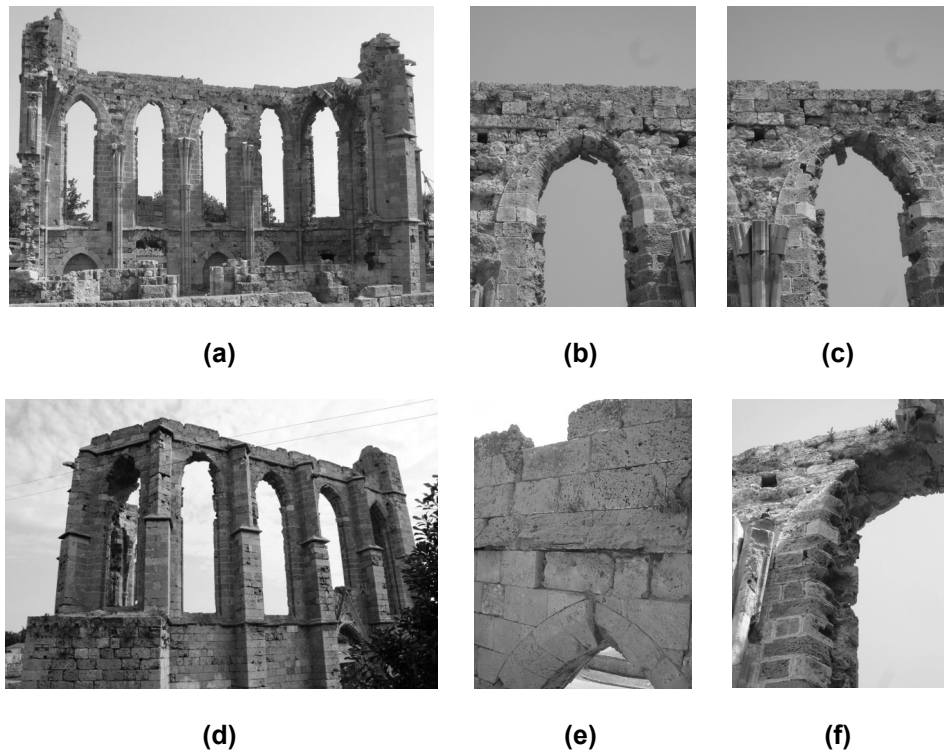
North façade: (a) interior view, (b) upper part of the second window (from left to right), (c) upper part of the third window (from left to right), (d) exterior view, (e) crack opening and sliding in the connection with West façade and (f) crack opening and sliding in the connection with the Apse
